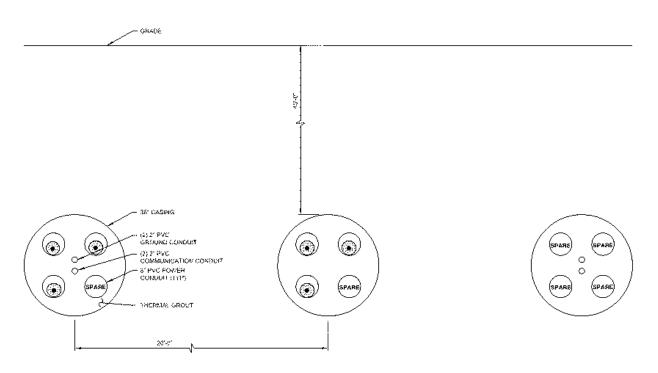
Typical 345 kV Duct Bank Cross Section
